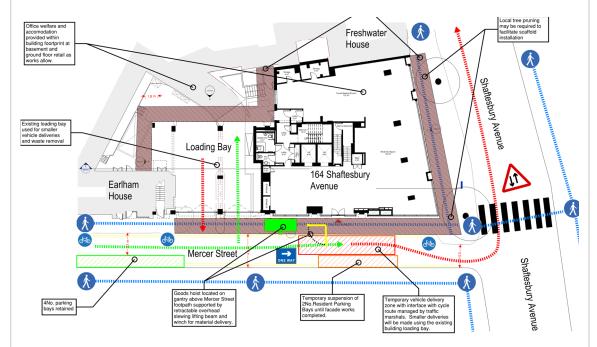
Extract of Logistics Plan indicating construction vehicle access/egress location on Mercer Street
